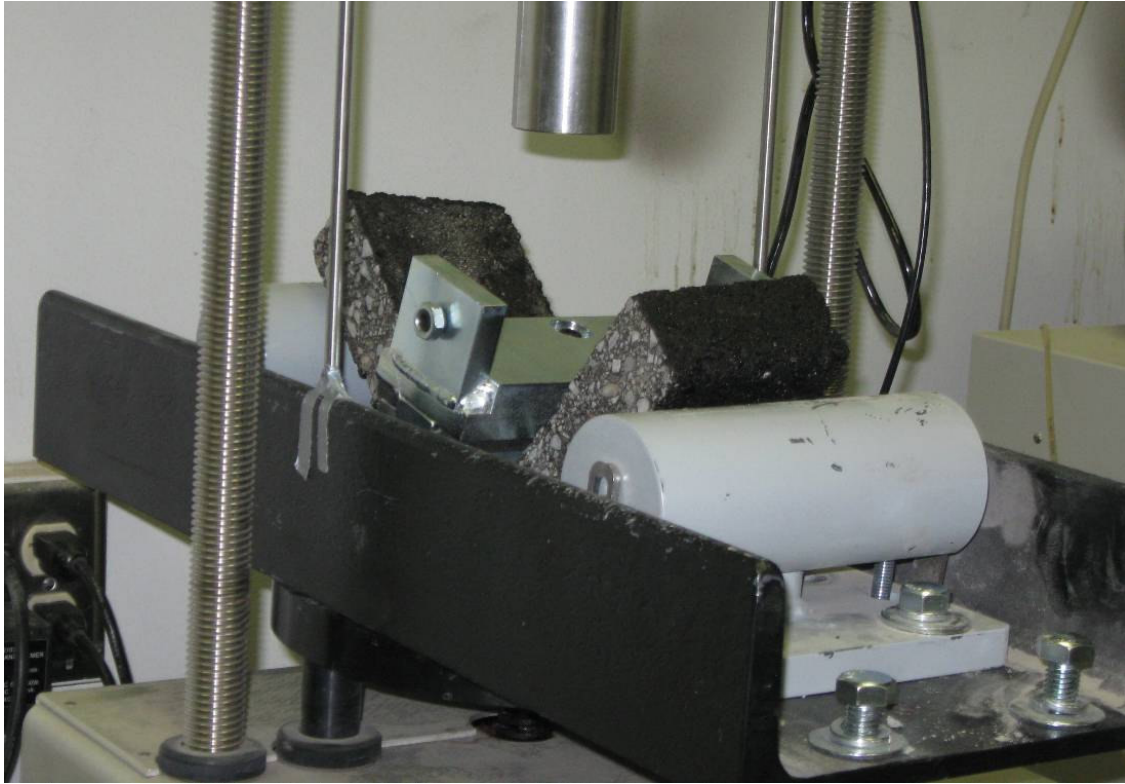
Cracked asphalt beam after 3-Point beam test
